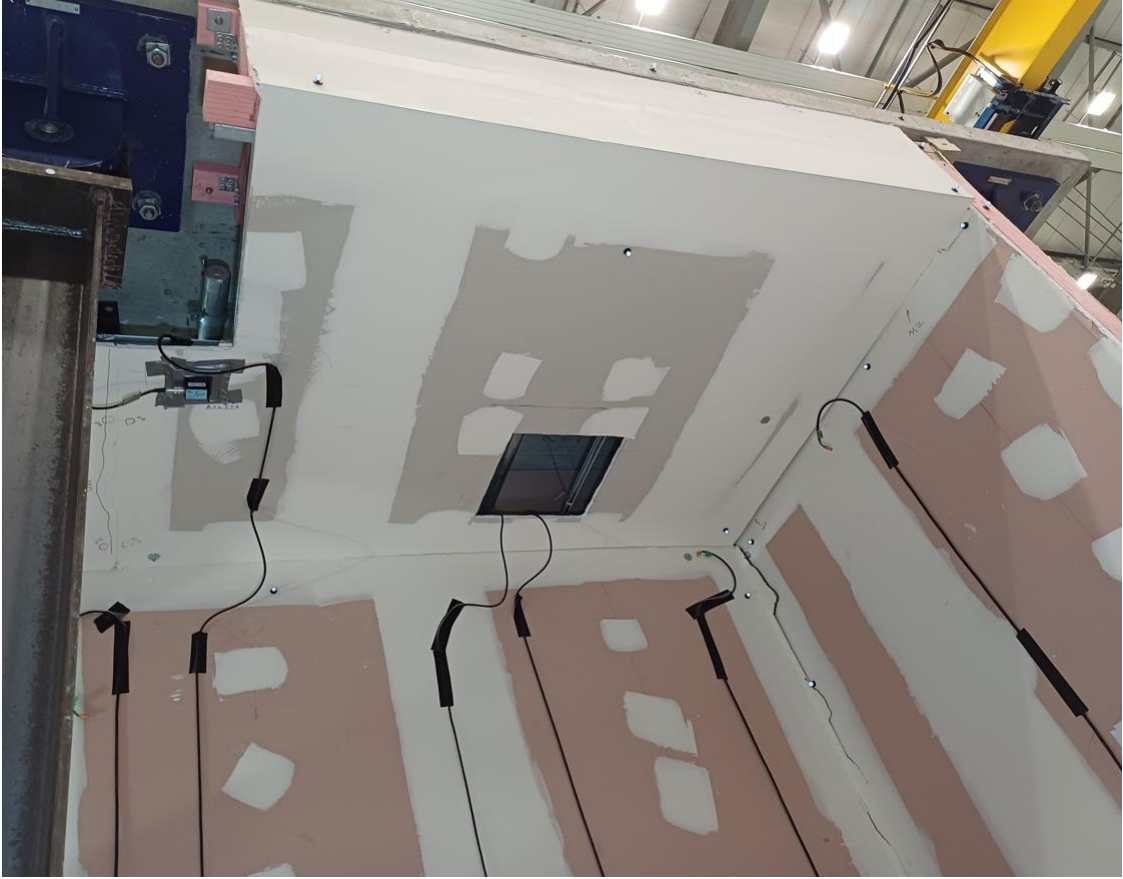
Northeast Elevation (looking at East Ceiling)
